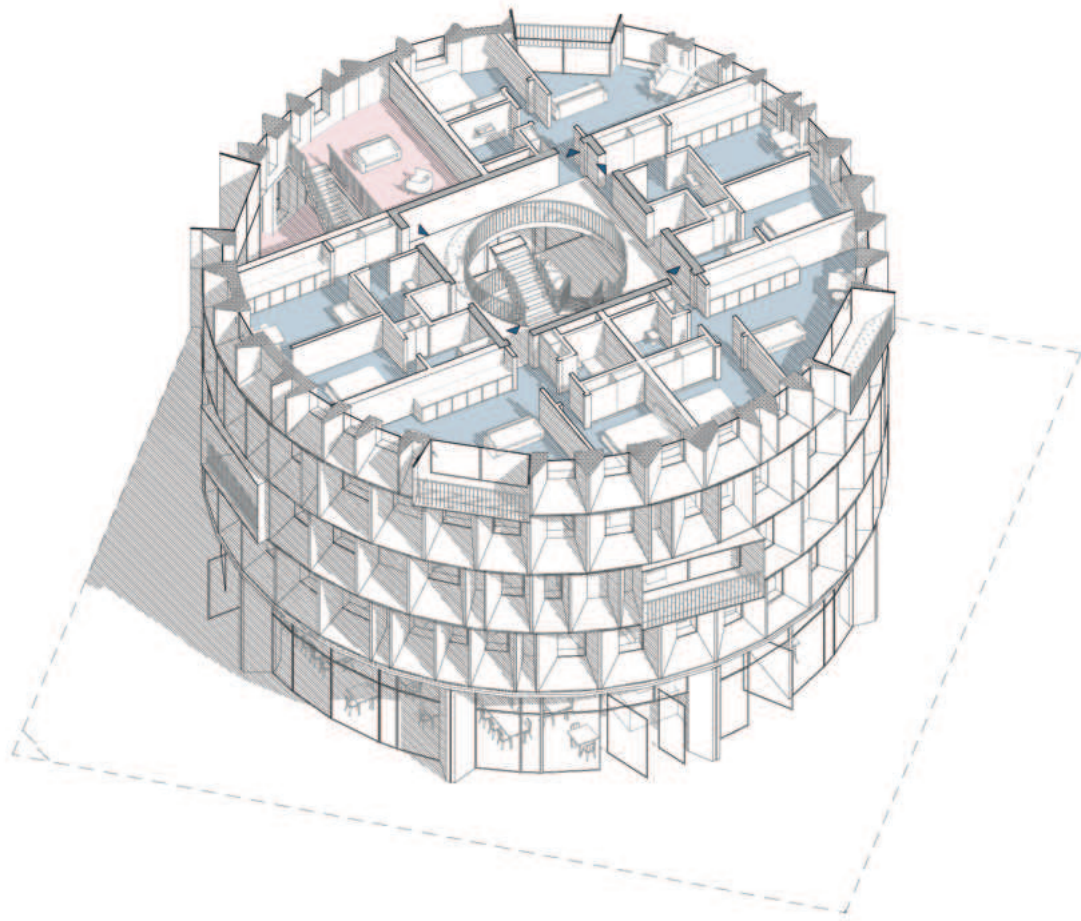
/ Top / Isometric view and horizontal section of facade configuration and standard floor plan
